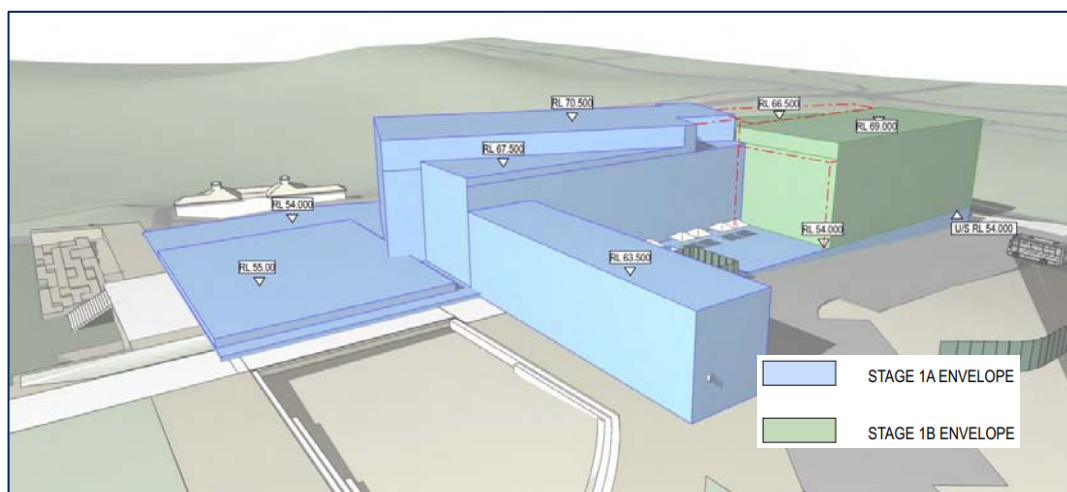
| STEAM and ILC building envelope – western perspective (Source: RtS)
